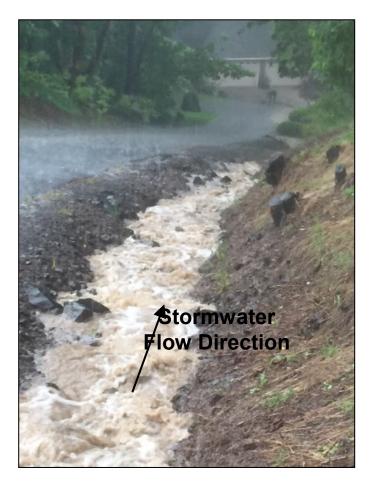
The junction for the ditch and driveway pipe are overwhelmed and flood waters drain into the front yard toward the house (5-18-15).
